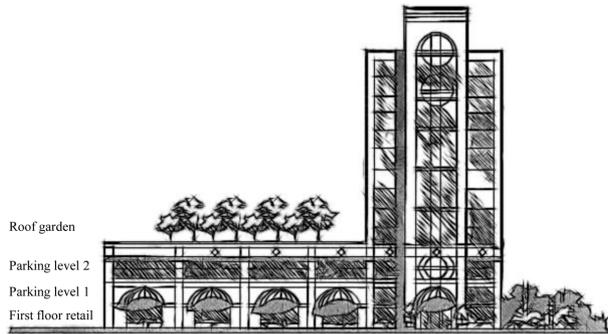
Architecturally integrated and enclosed parking should be encouraged for tall building design whenever possible. (Sketch by author; adopted from www.tampagov.net)
